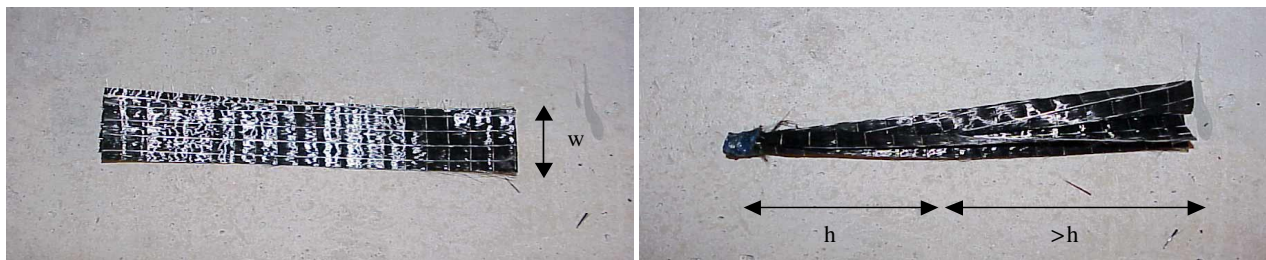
CFRP Sheet (Left) and CFRP Anchor Dowel (Right)
